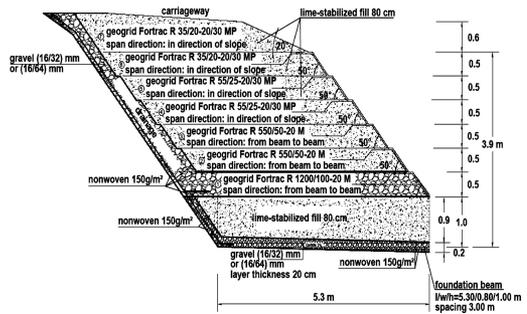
Oberstdorf: geogrid reinforcement (the bottom geogrids spanning over the beams are installed with their strong MD parallel to the road axis).
